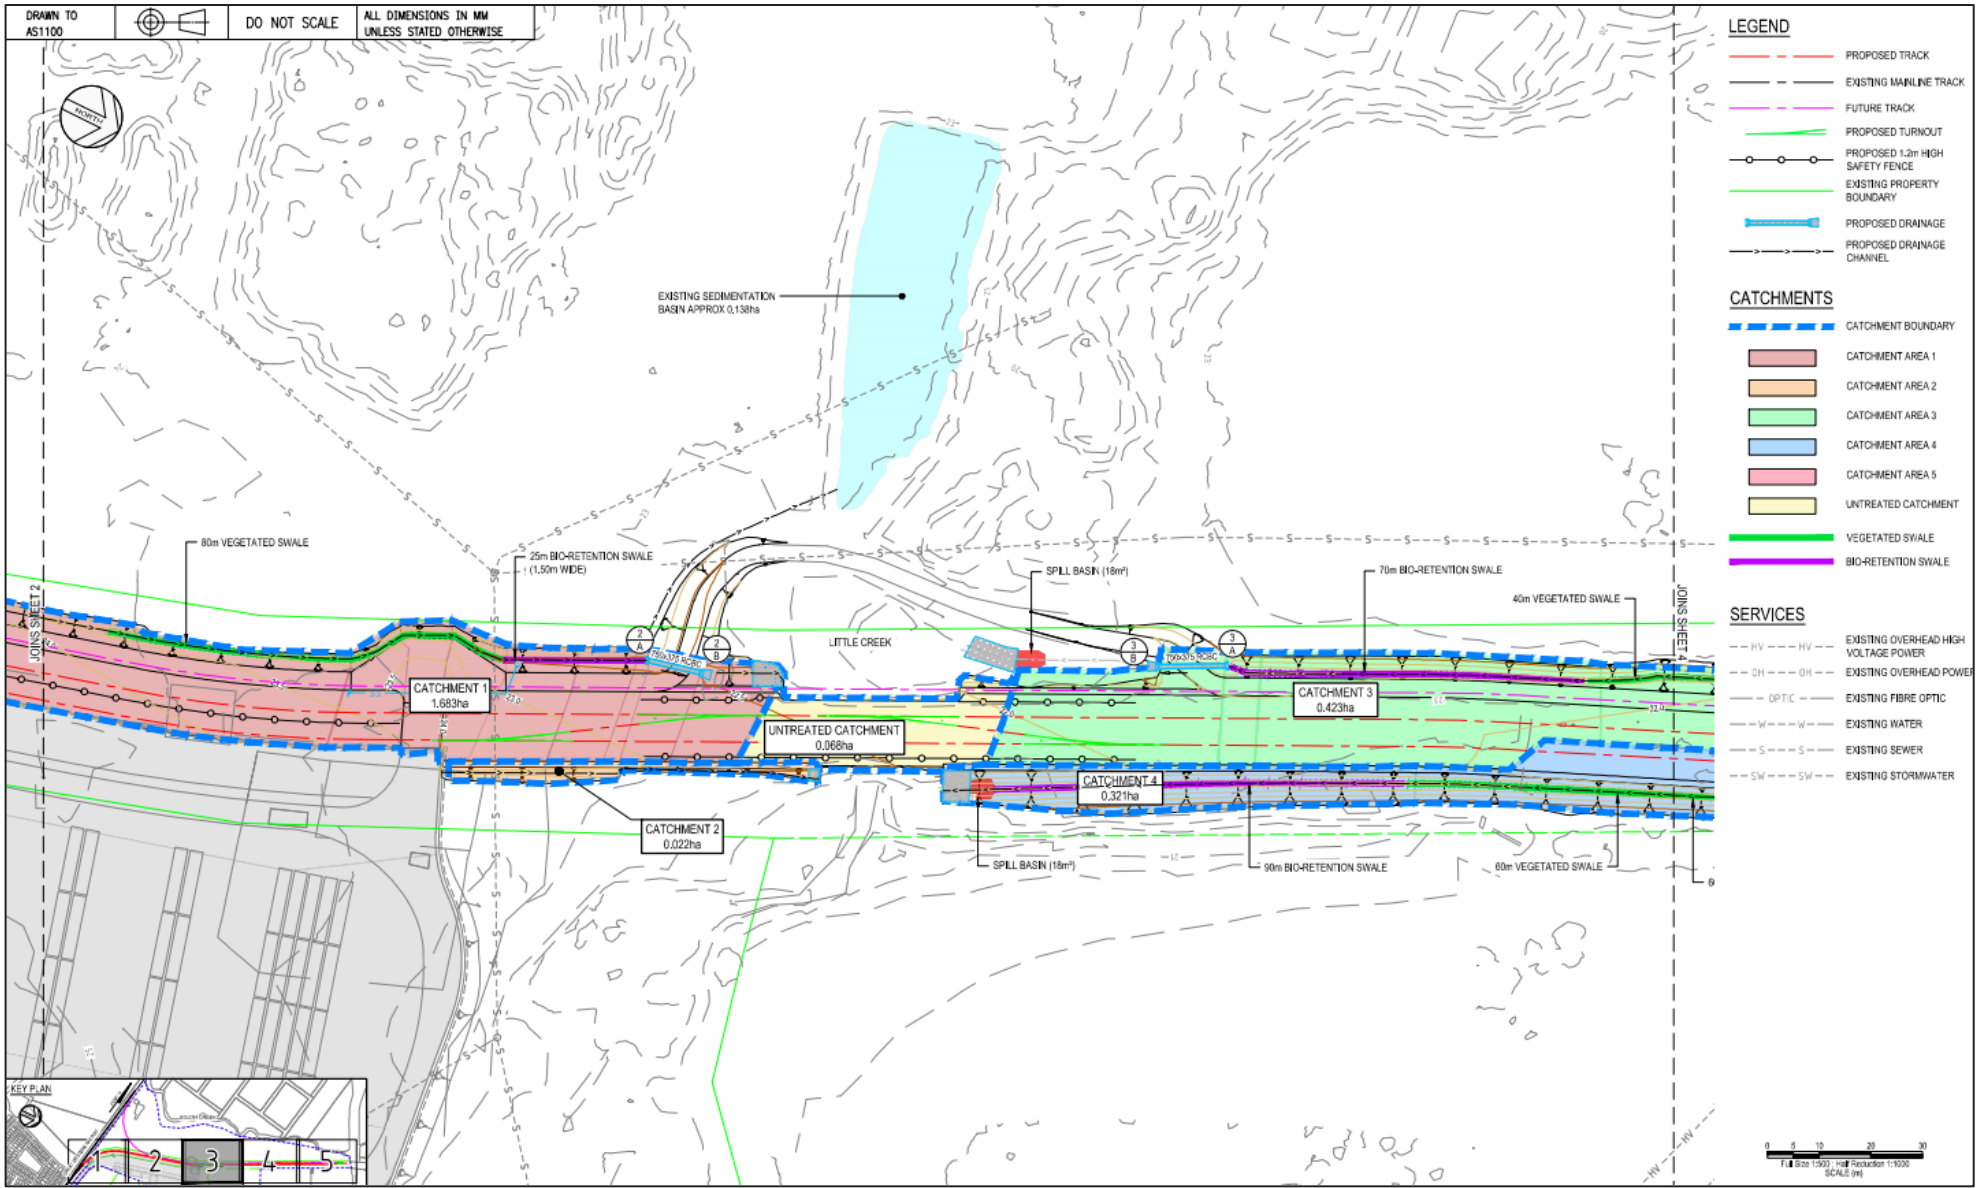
| Proposed stormwater infrastructure for Little Creek Crossing (Source: Applicant's Stormwater Management Plan)
